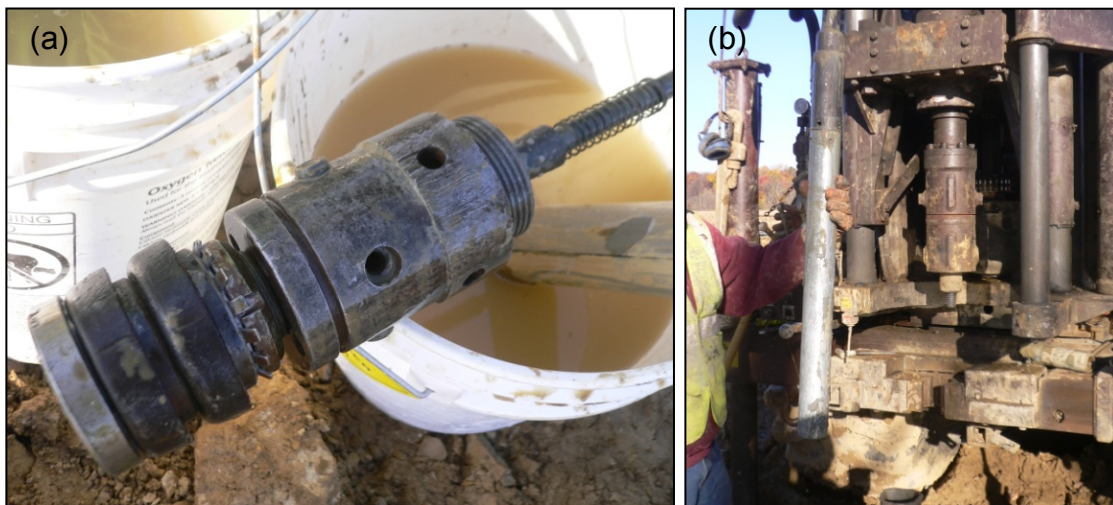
Fixed piston sampler: (a) fixed piston and (b) piston mounted on Shelby tube
